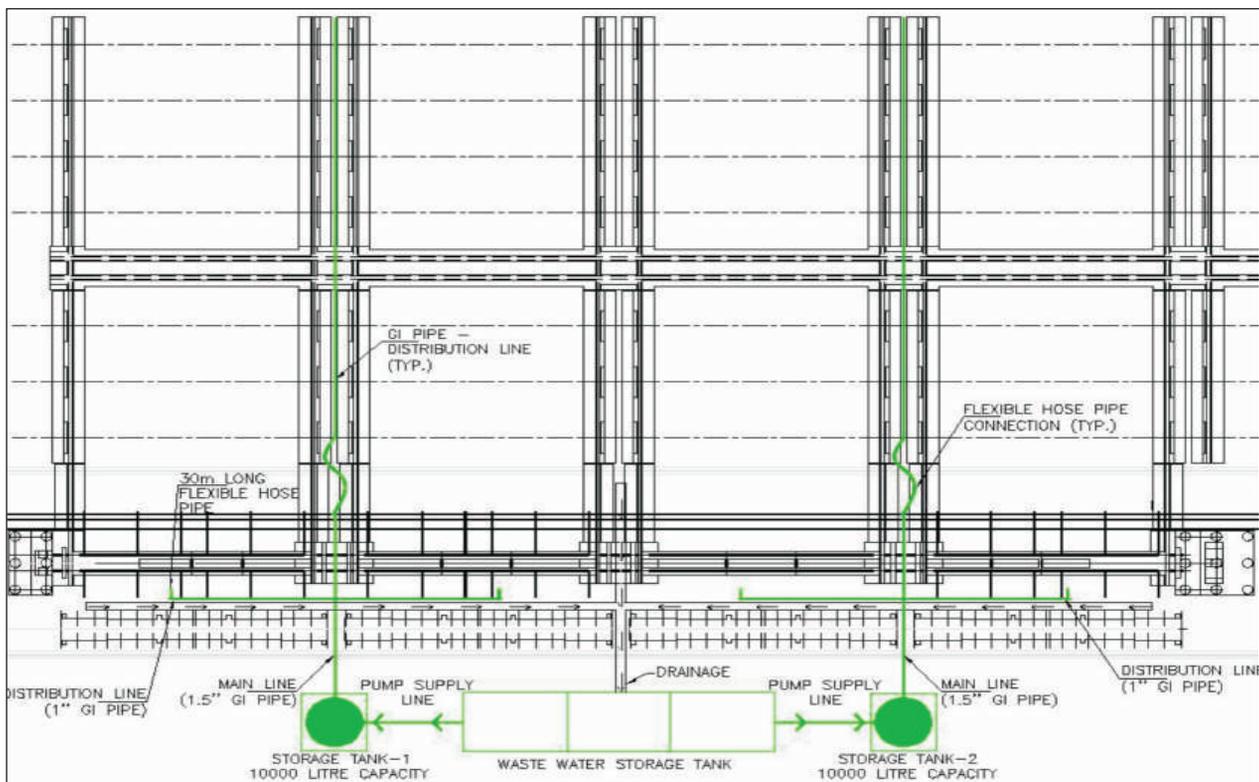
Sketch showing Curing arrangement with Hose pipe layout
